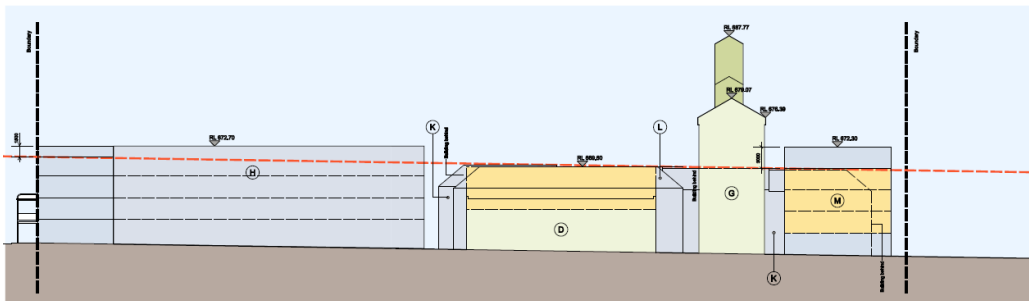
Long section indicating potential floor space that could be achieved in yellow (Source: Karl Walls Design)
